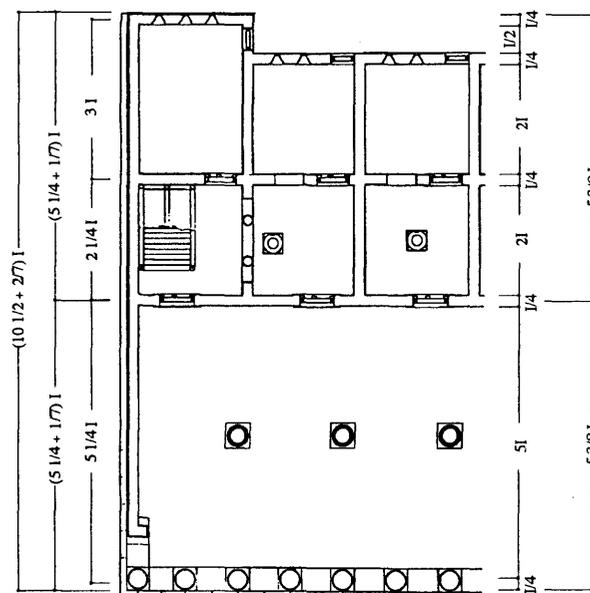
The planning of aisles and rooms of the south stoa
